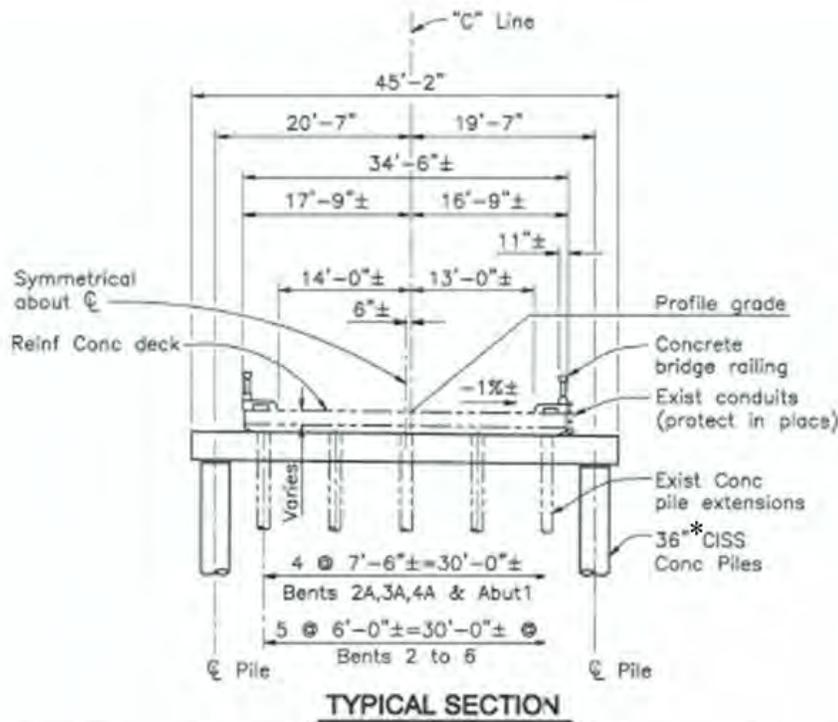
Alternative 4 Retrofit with outrigger bents (Alternative 5 similar)
